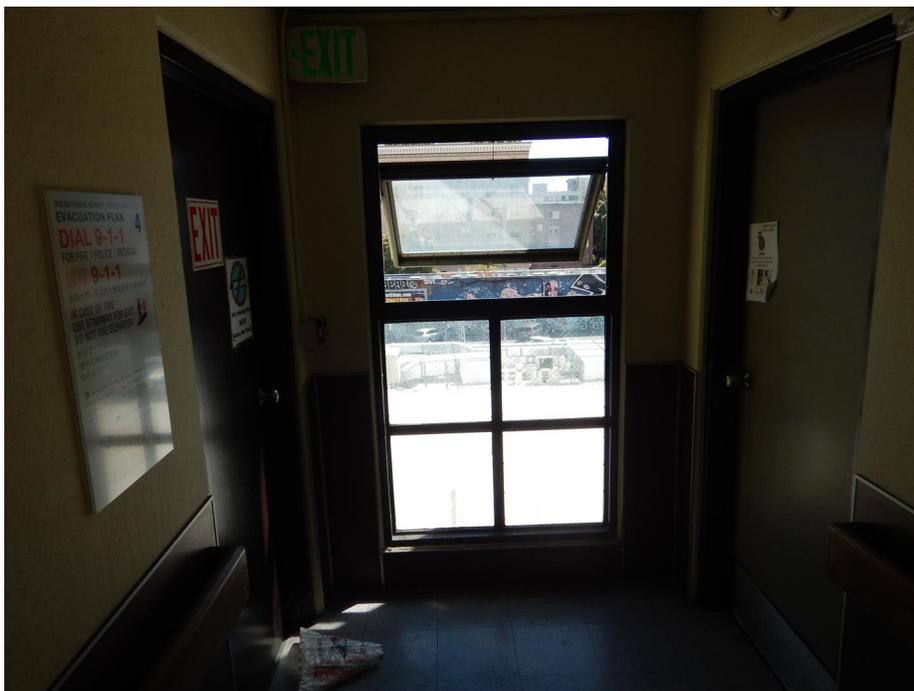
Level 4 corridor window. Note deteriorated sealant.
